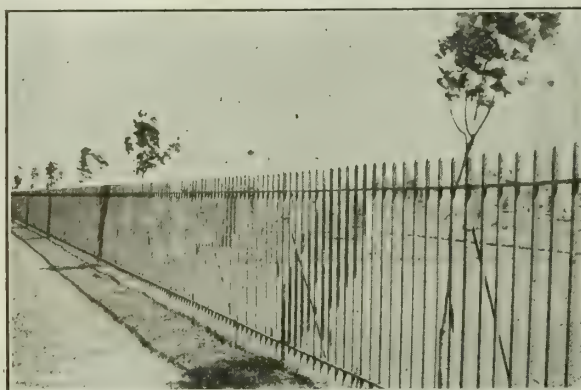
A 5-FT. HIGH RAILING OF HEAVY CONSTRUCTION
